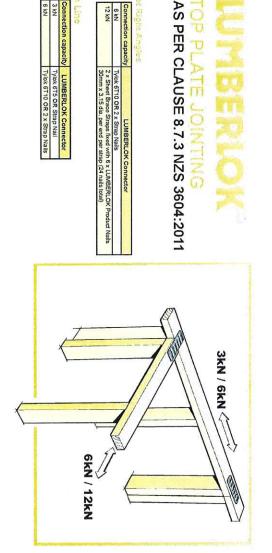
Connecting top plates to external walls at right angles - Walls containing bracing (see 8.73.4)
